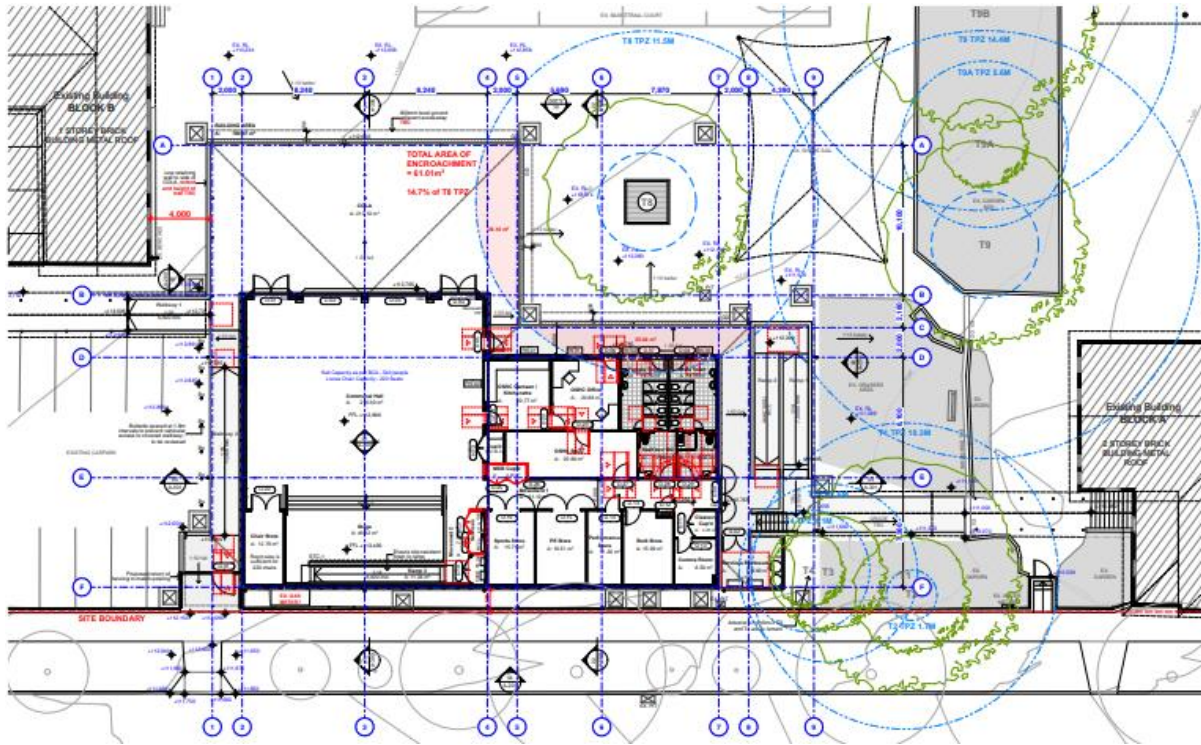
Proposed Hall Layout (Source: BKA Architects)
